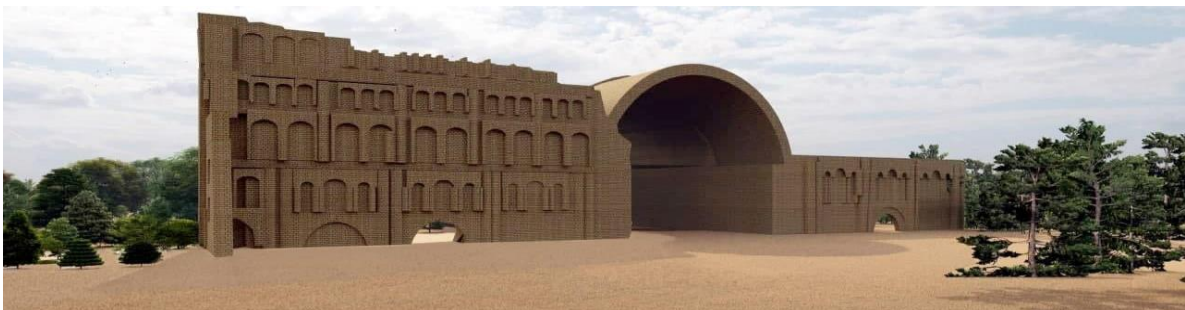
front elevation of a Taq Kusra after implementing the hybrid Re-assembly technique
